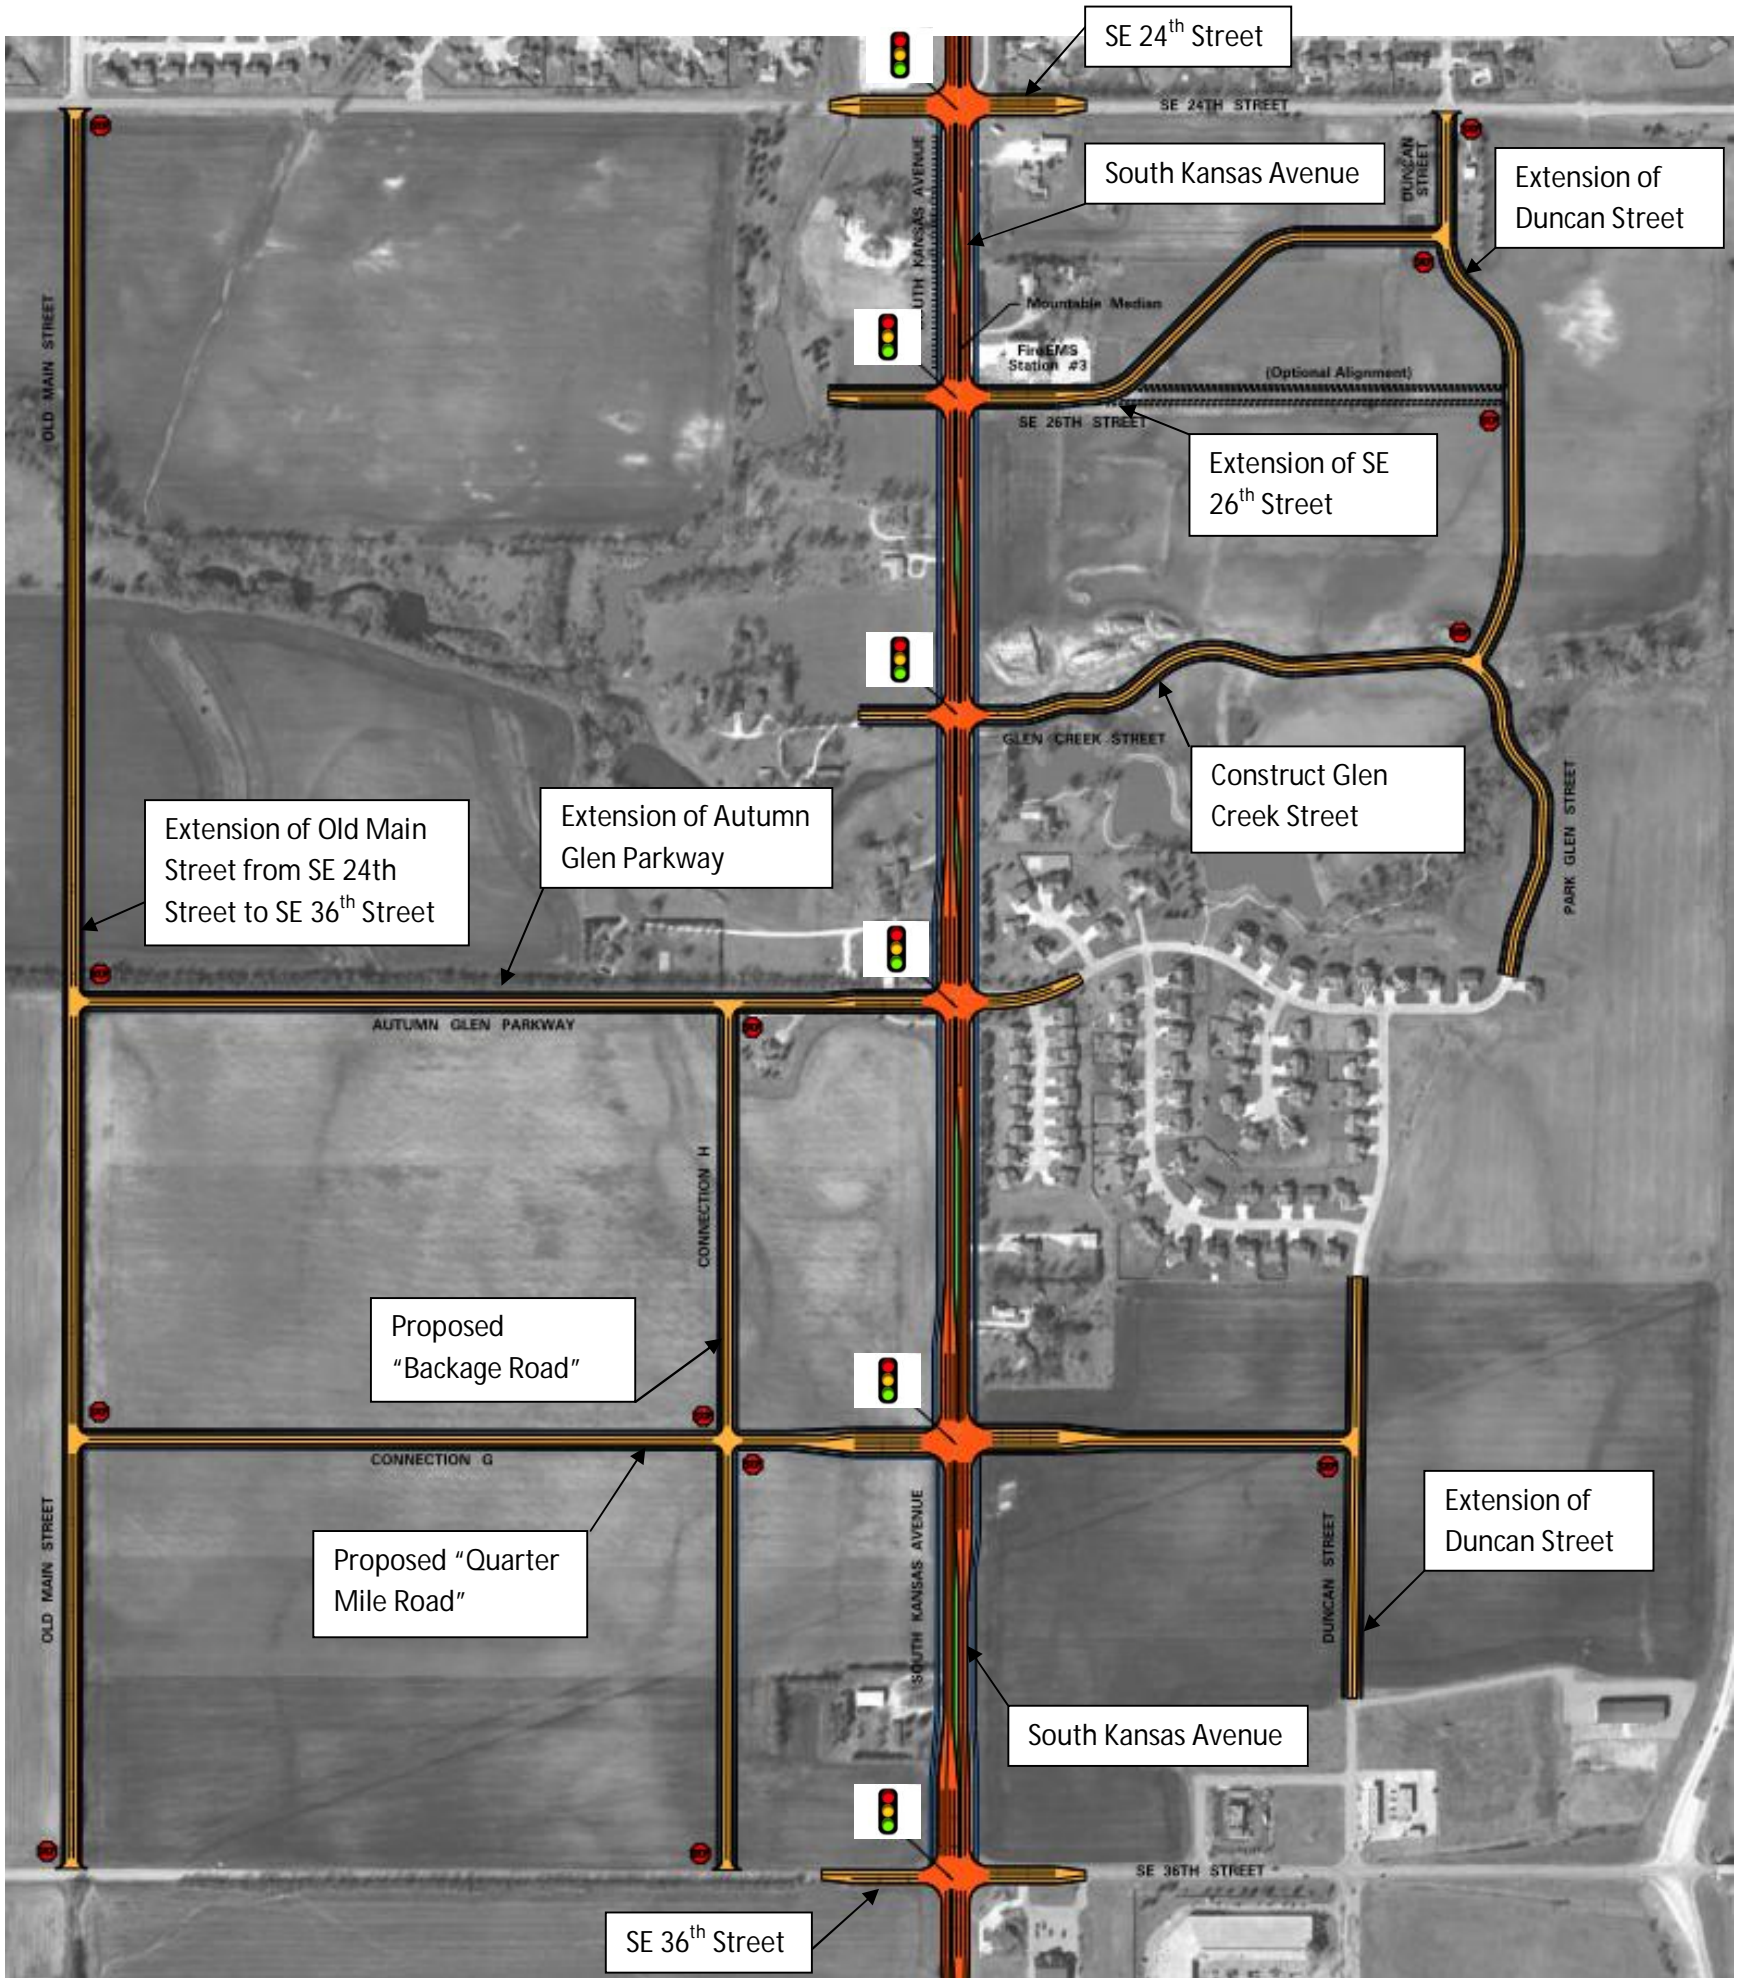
2030 Proposed Roadway Configuration Sketch
